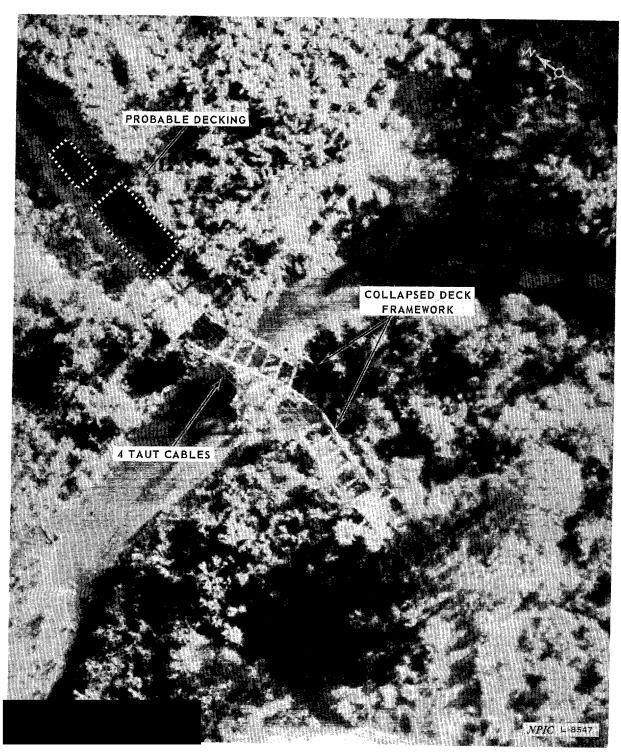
VEHICULAR CABLE BRIDGE, ROUTE 15, NORTH VIETNAM
